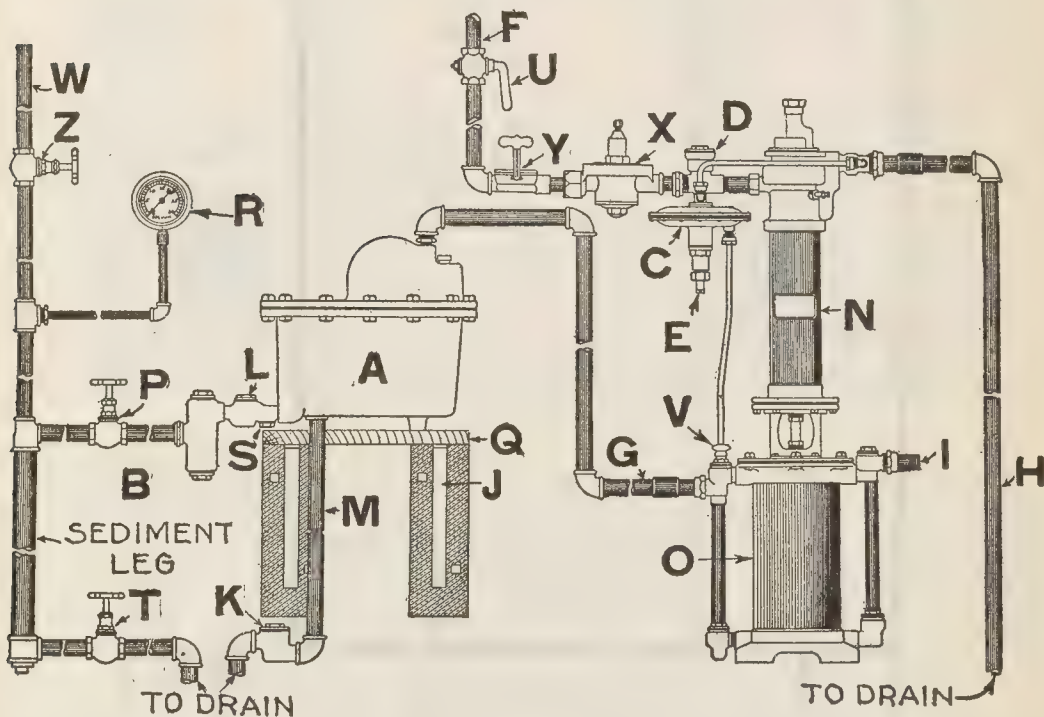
,544.—Bishop-Babcock-Becker hydraulic vacuum pump and equipment. *The parts are:* A, separator; B, strainer; C, vacuum controller; D, automatic cut-off; E, vacuum adjusting screw; F, water inlet pipe; G, air suction pipe; H, water outlet pipe; I, air outlet; J, bracket; K, check valve; L, check valve; M, separator drain; N, motive cylinder; O, air cylinder; P, globe valve; Q, shelf; R, vacuum gauge; S, separator clean out; T, globe valve; U, water shut-off cock; V, oil cup screw; W, riser to air main; X, water pressure regulator No. 367; Y, water strainer No. 2239; Z, globe valve.
